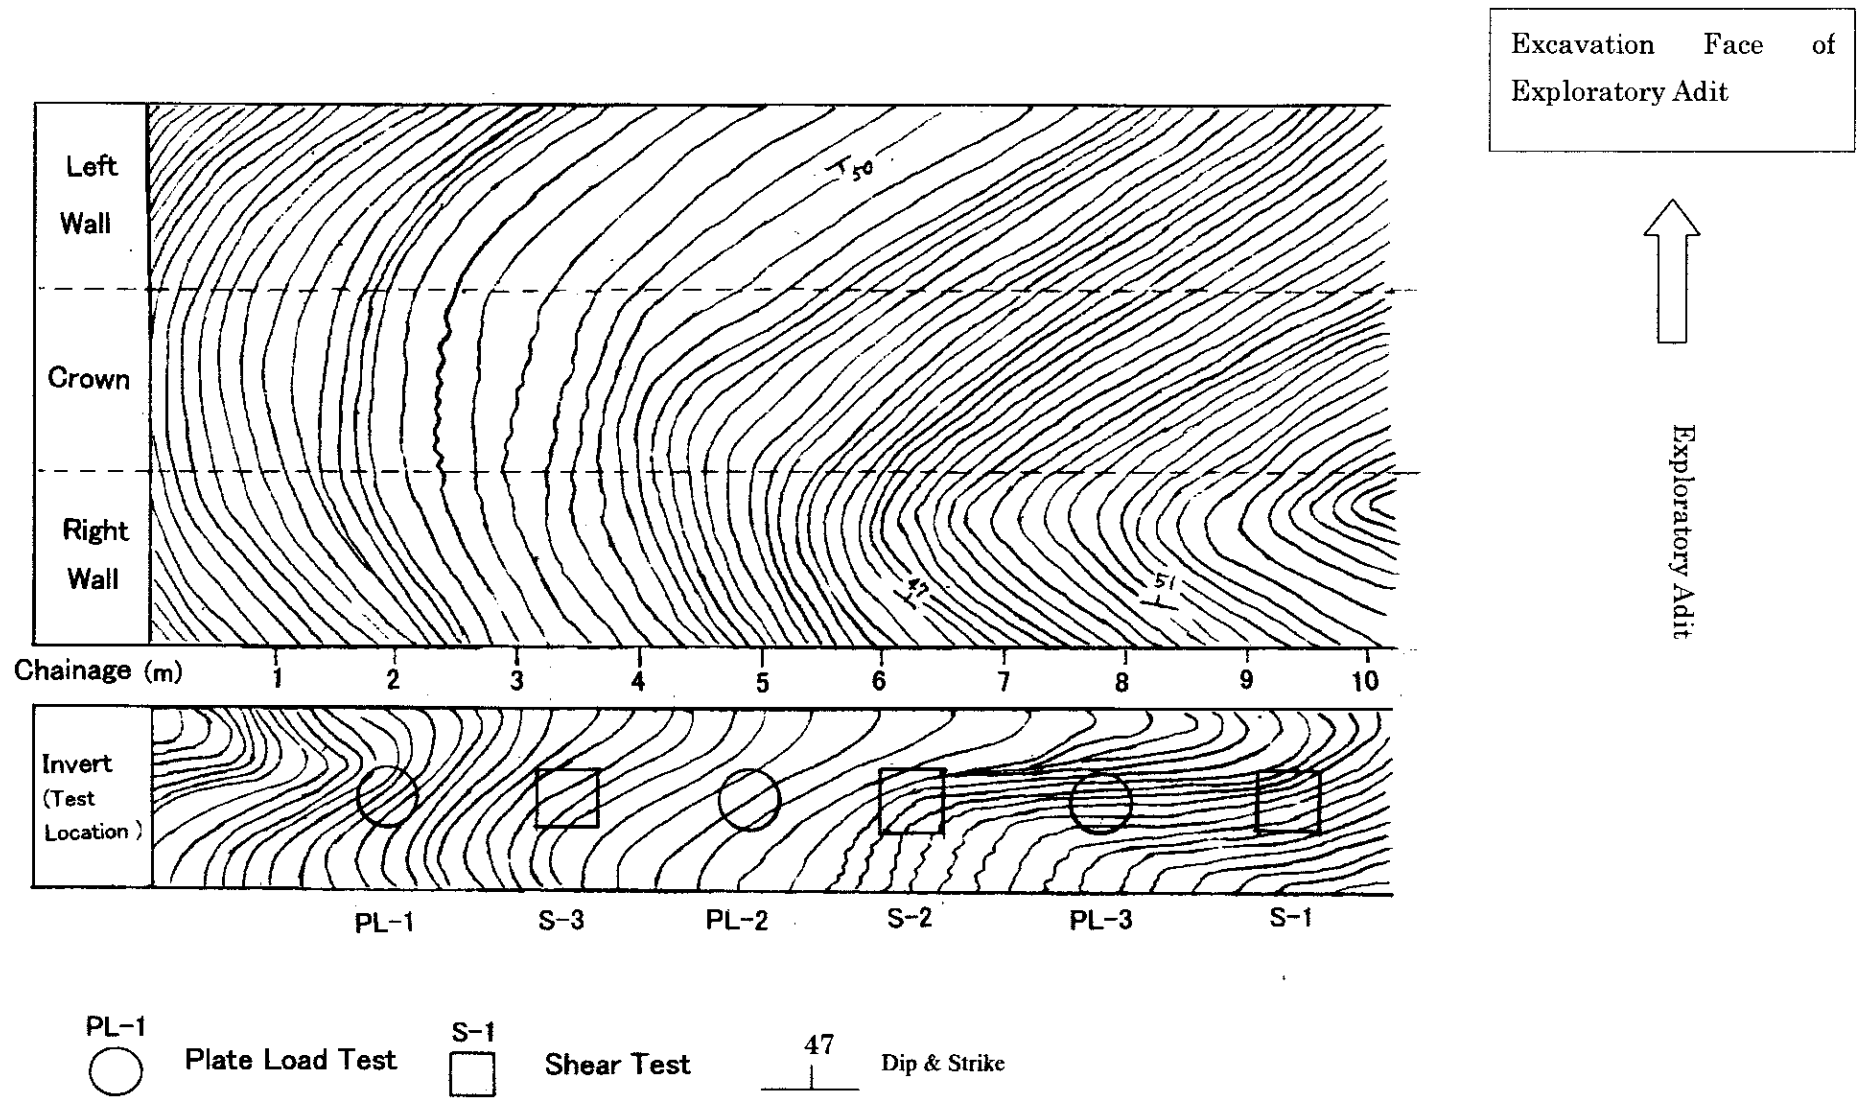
Plan of Branch Adit for In-situ Rock Testing
